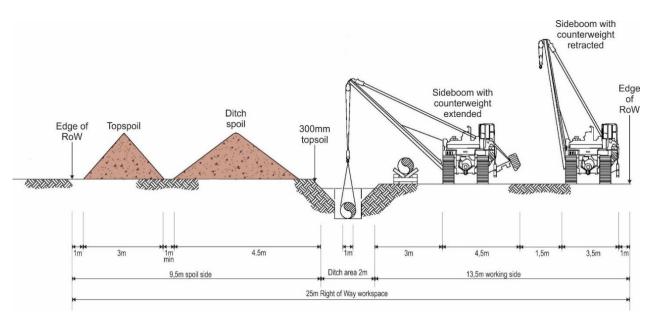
Schematic diagram showing the construction train for a flowline. The construction right of way width does not need to exceed 30 m
